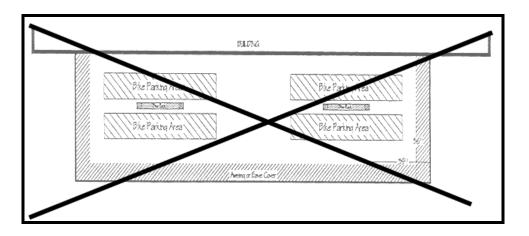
I.10.b Covered Bike Parking Layout
